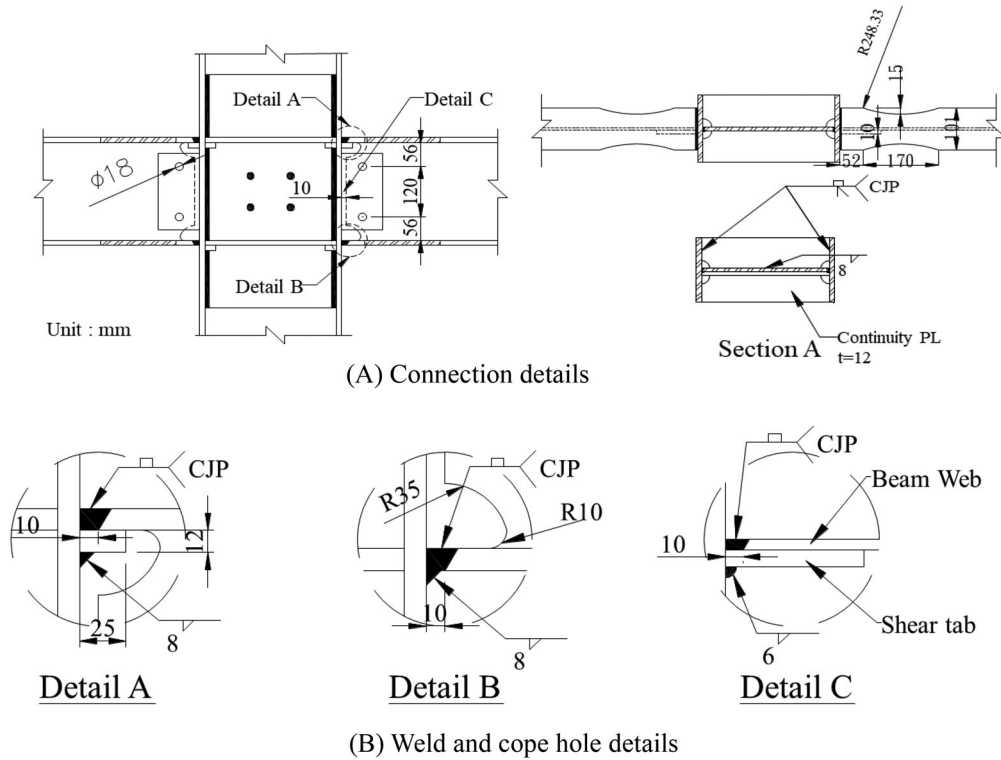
Subassemblage specimen connection details [Specimen IC-37-S(R)]
